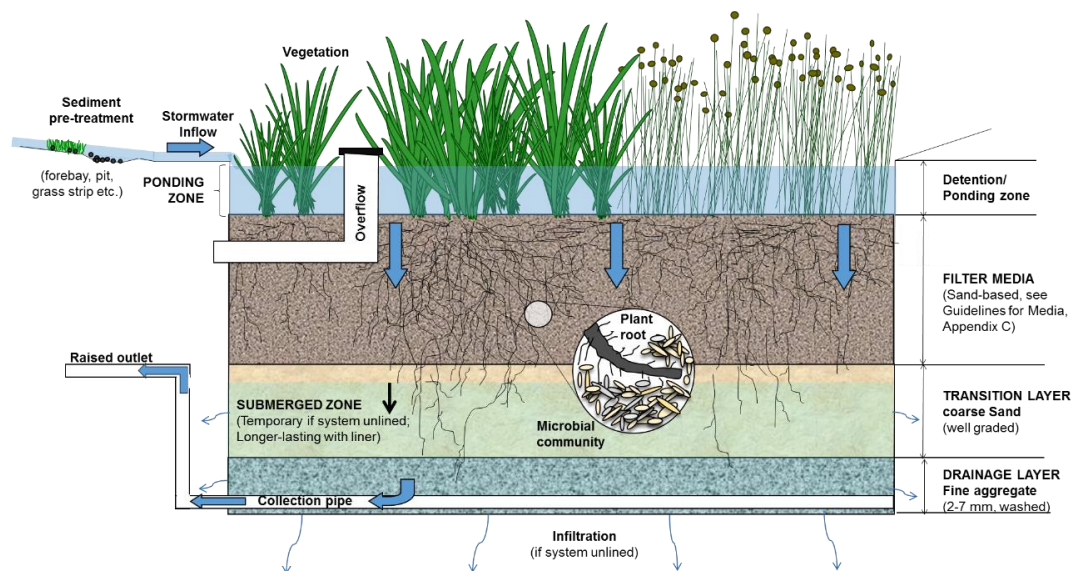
Stormwater Biofiltration Systems with Constructed Wetlands or Rain Gardens (Source: Url 22)
